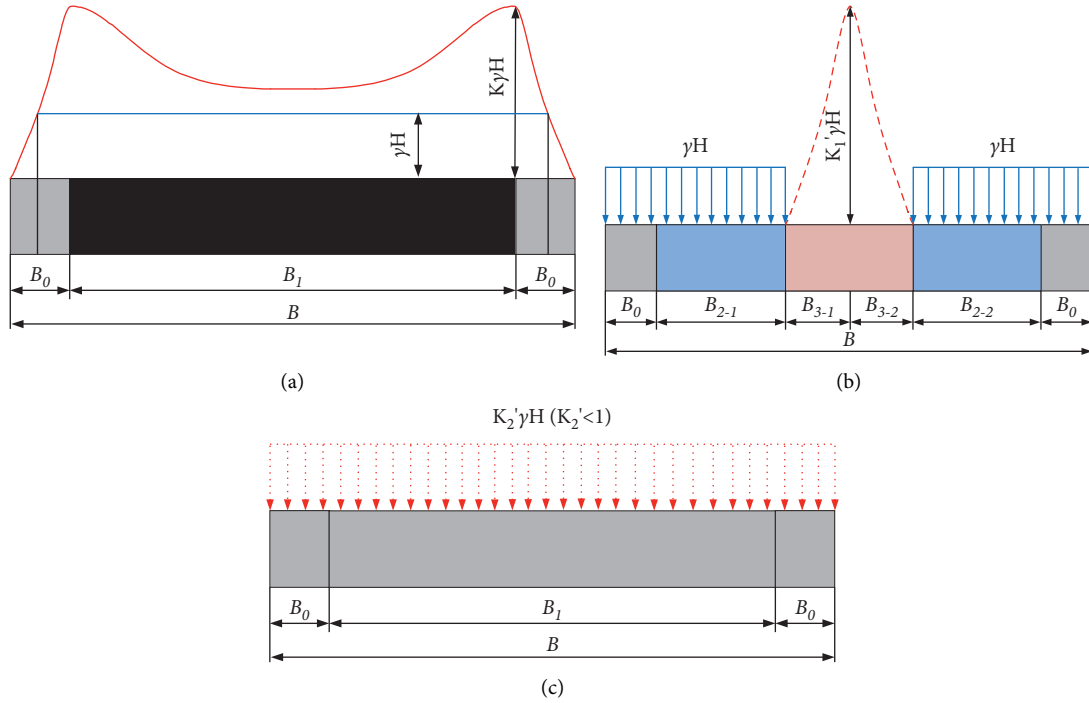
Mechanical model of the hydraulic cutting of the residual coal pillar. (a) Before coal pillar failure. (b) In the process of coal pillar failure. (c) After coal pillar failure.
